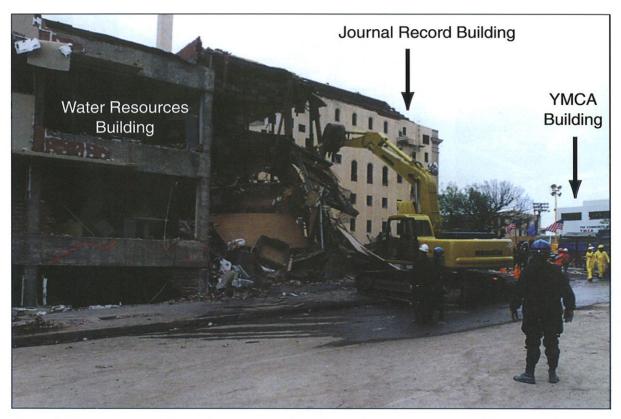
Damaged Water Resources building, Journal Record building, and YMCA building, looking northeast.
